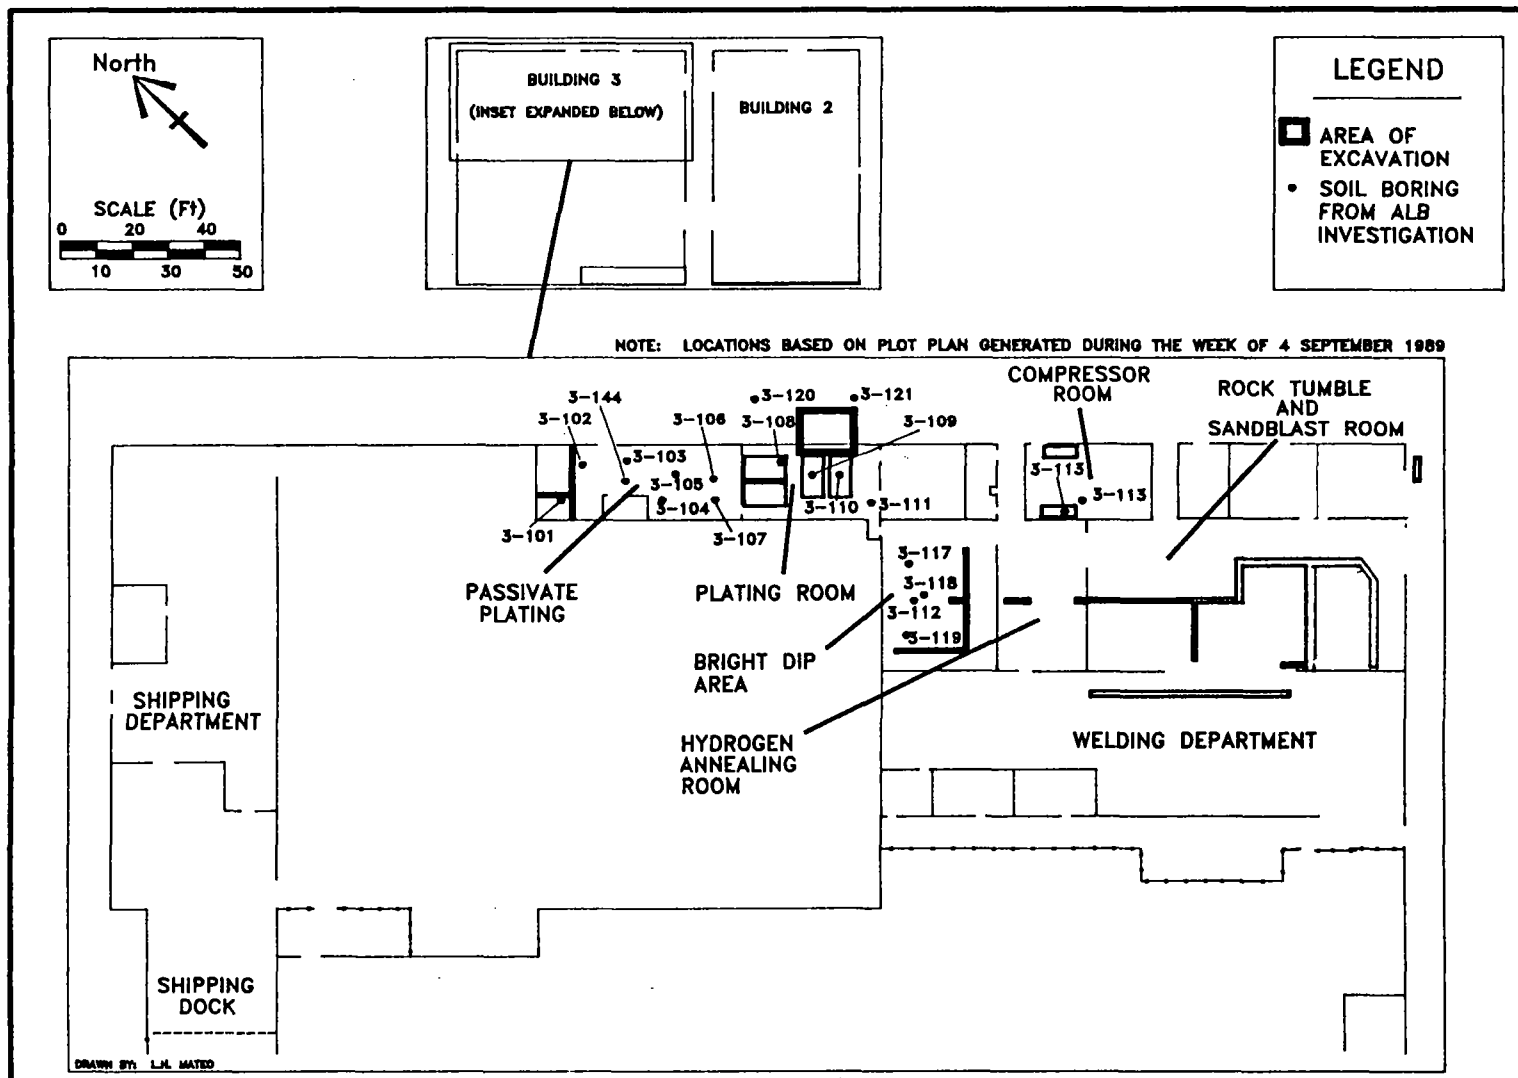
LOCATIONS OF PREVIOUS SOIL BORINGS IN BUILDING 3
